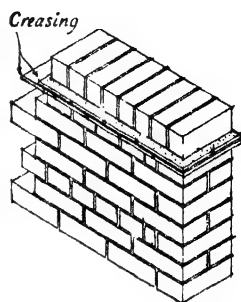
Garden Wall Bond with brick-on-edge coping and tile creasing.
